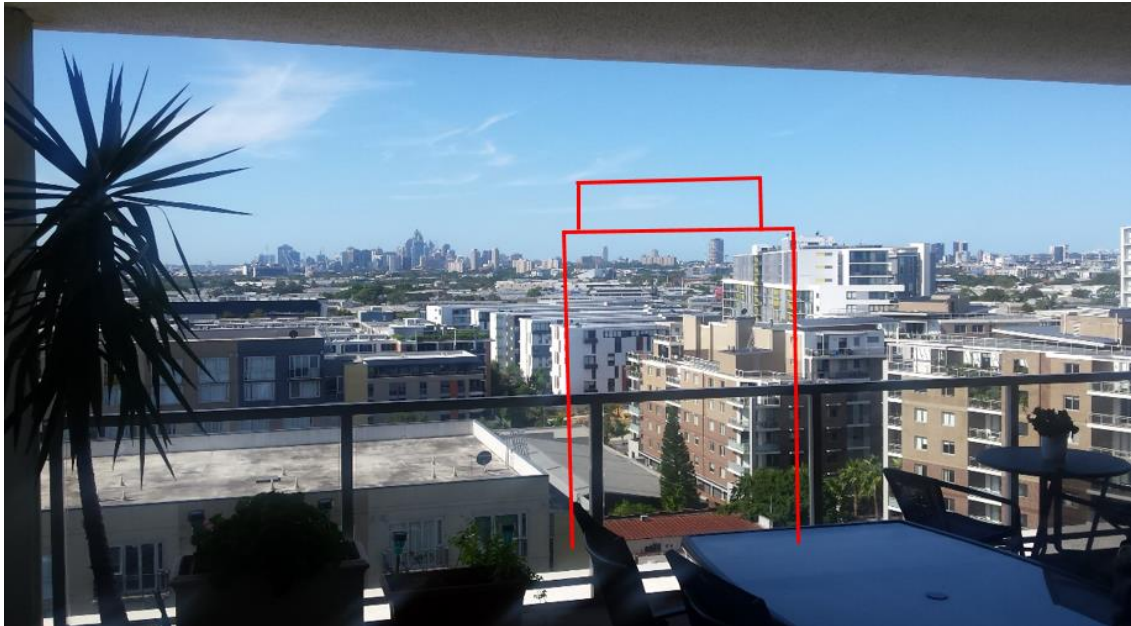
Looking north-east from the balcony with approximate proposed built envelope
